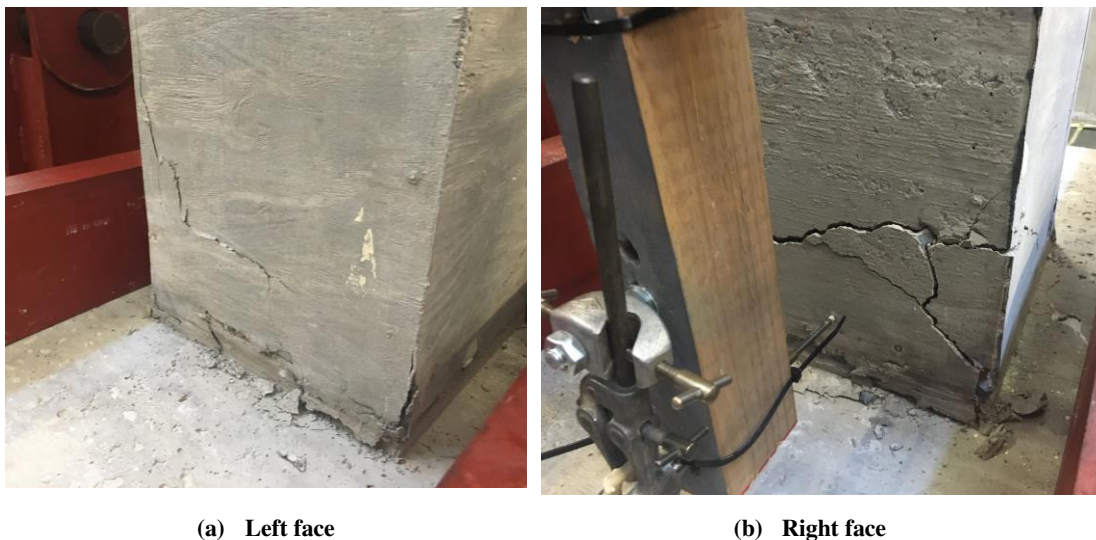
Initial crack patterns and concrete spalling on (a) left face and (b) right face of the column during the 0.78 g test
